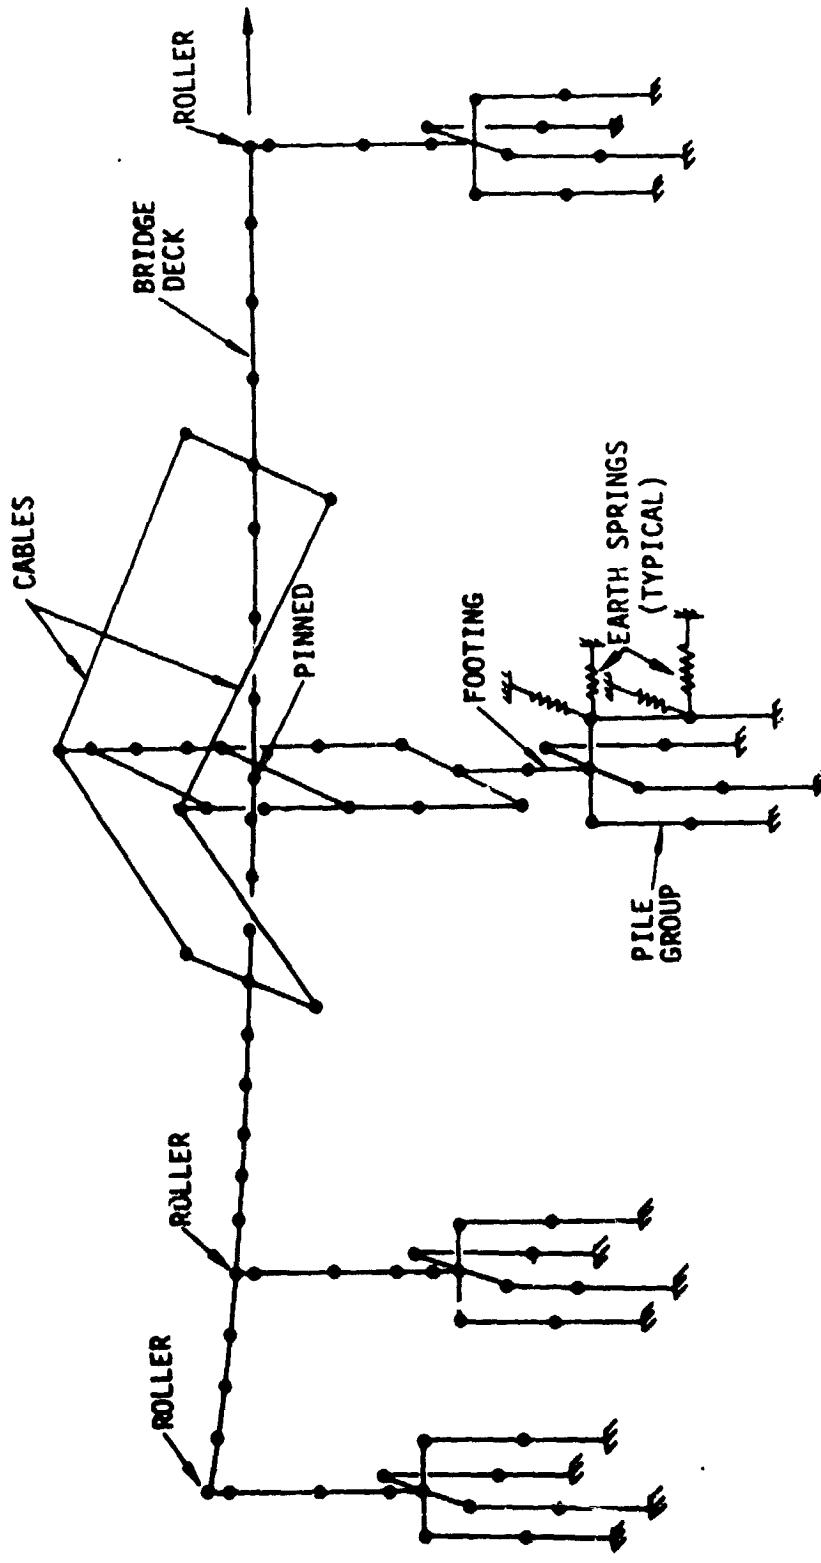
CONCRETE FINITE ELEMENT (STICK) MODEL
